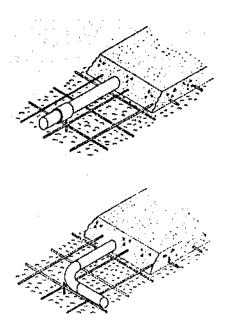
Conduit installation in concrete slabs. (From Means, 1986.)
